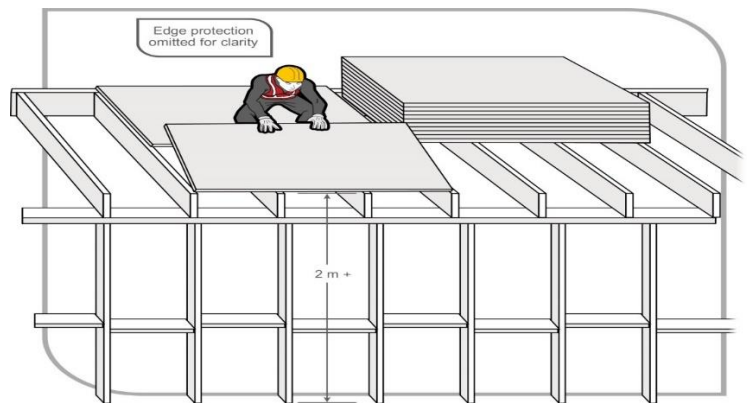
LAYING SHEET FLOORING AT UPPER LEVEL
